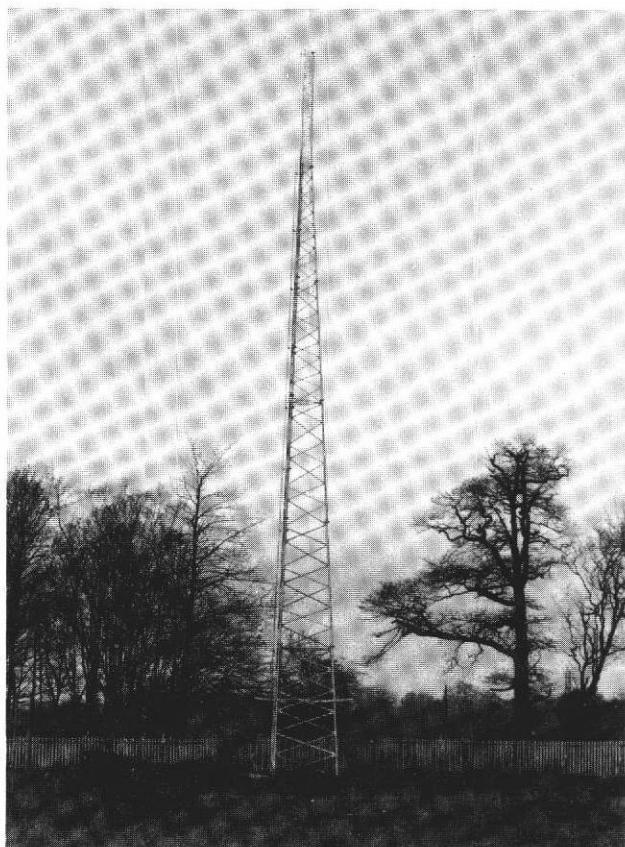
The BBC-designed triangular lattice tower constructed from tubular steel members.
